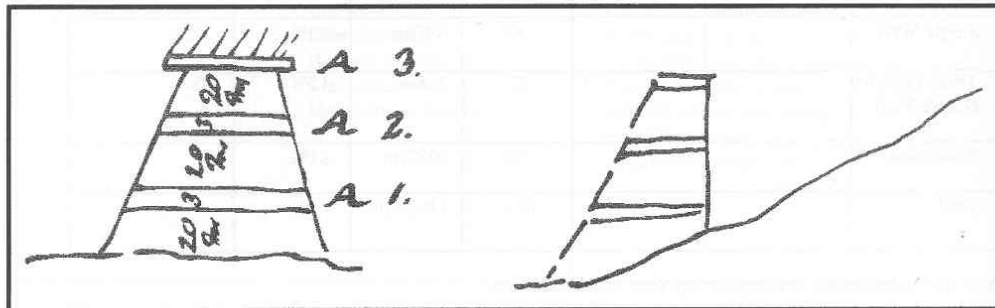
Charles Fothergill's 1805 sketch cross sections of walls in Wensleydale. The right hand version indicates the form of a wall built running round a hill-side.
